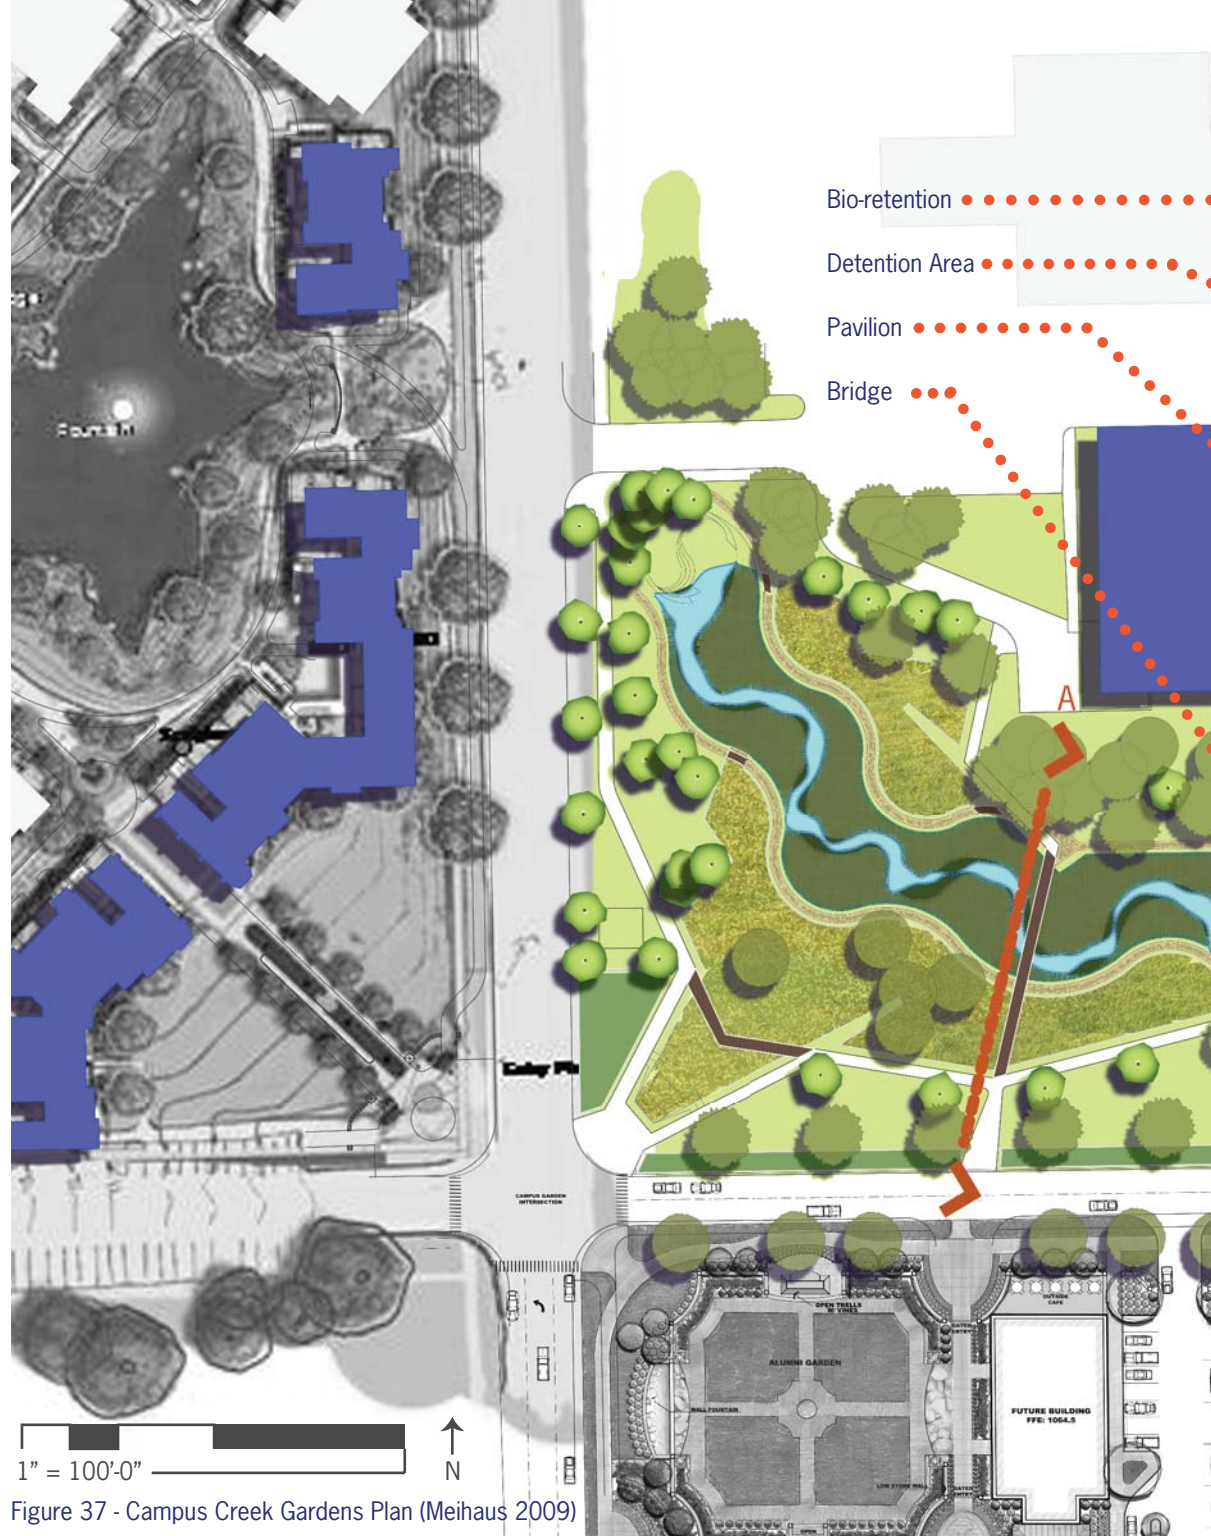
Campus Creek Gardens Plan (Meihaus 2009)
